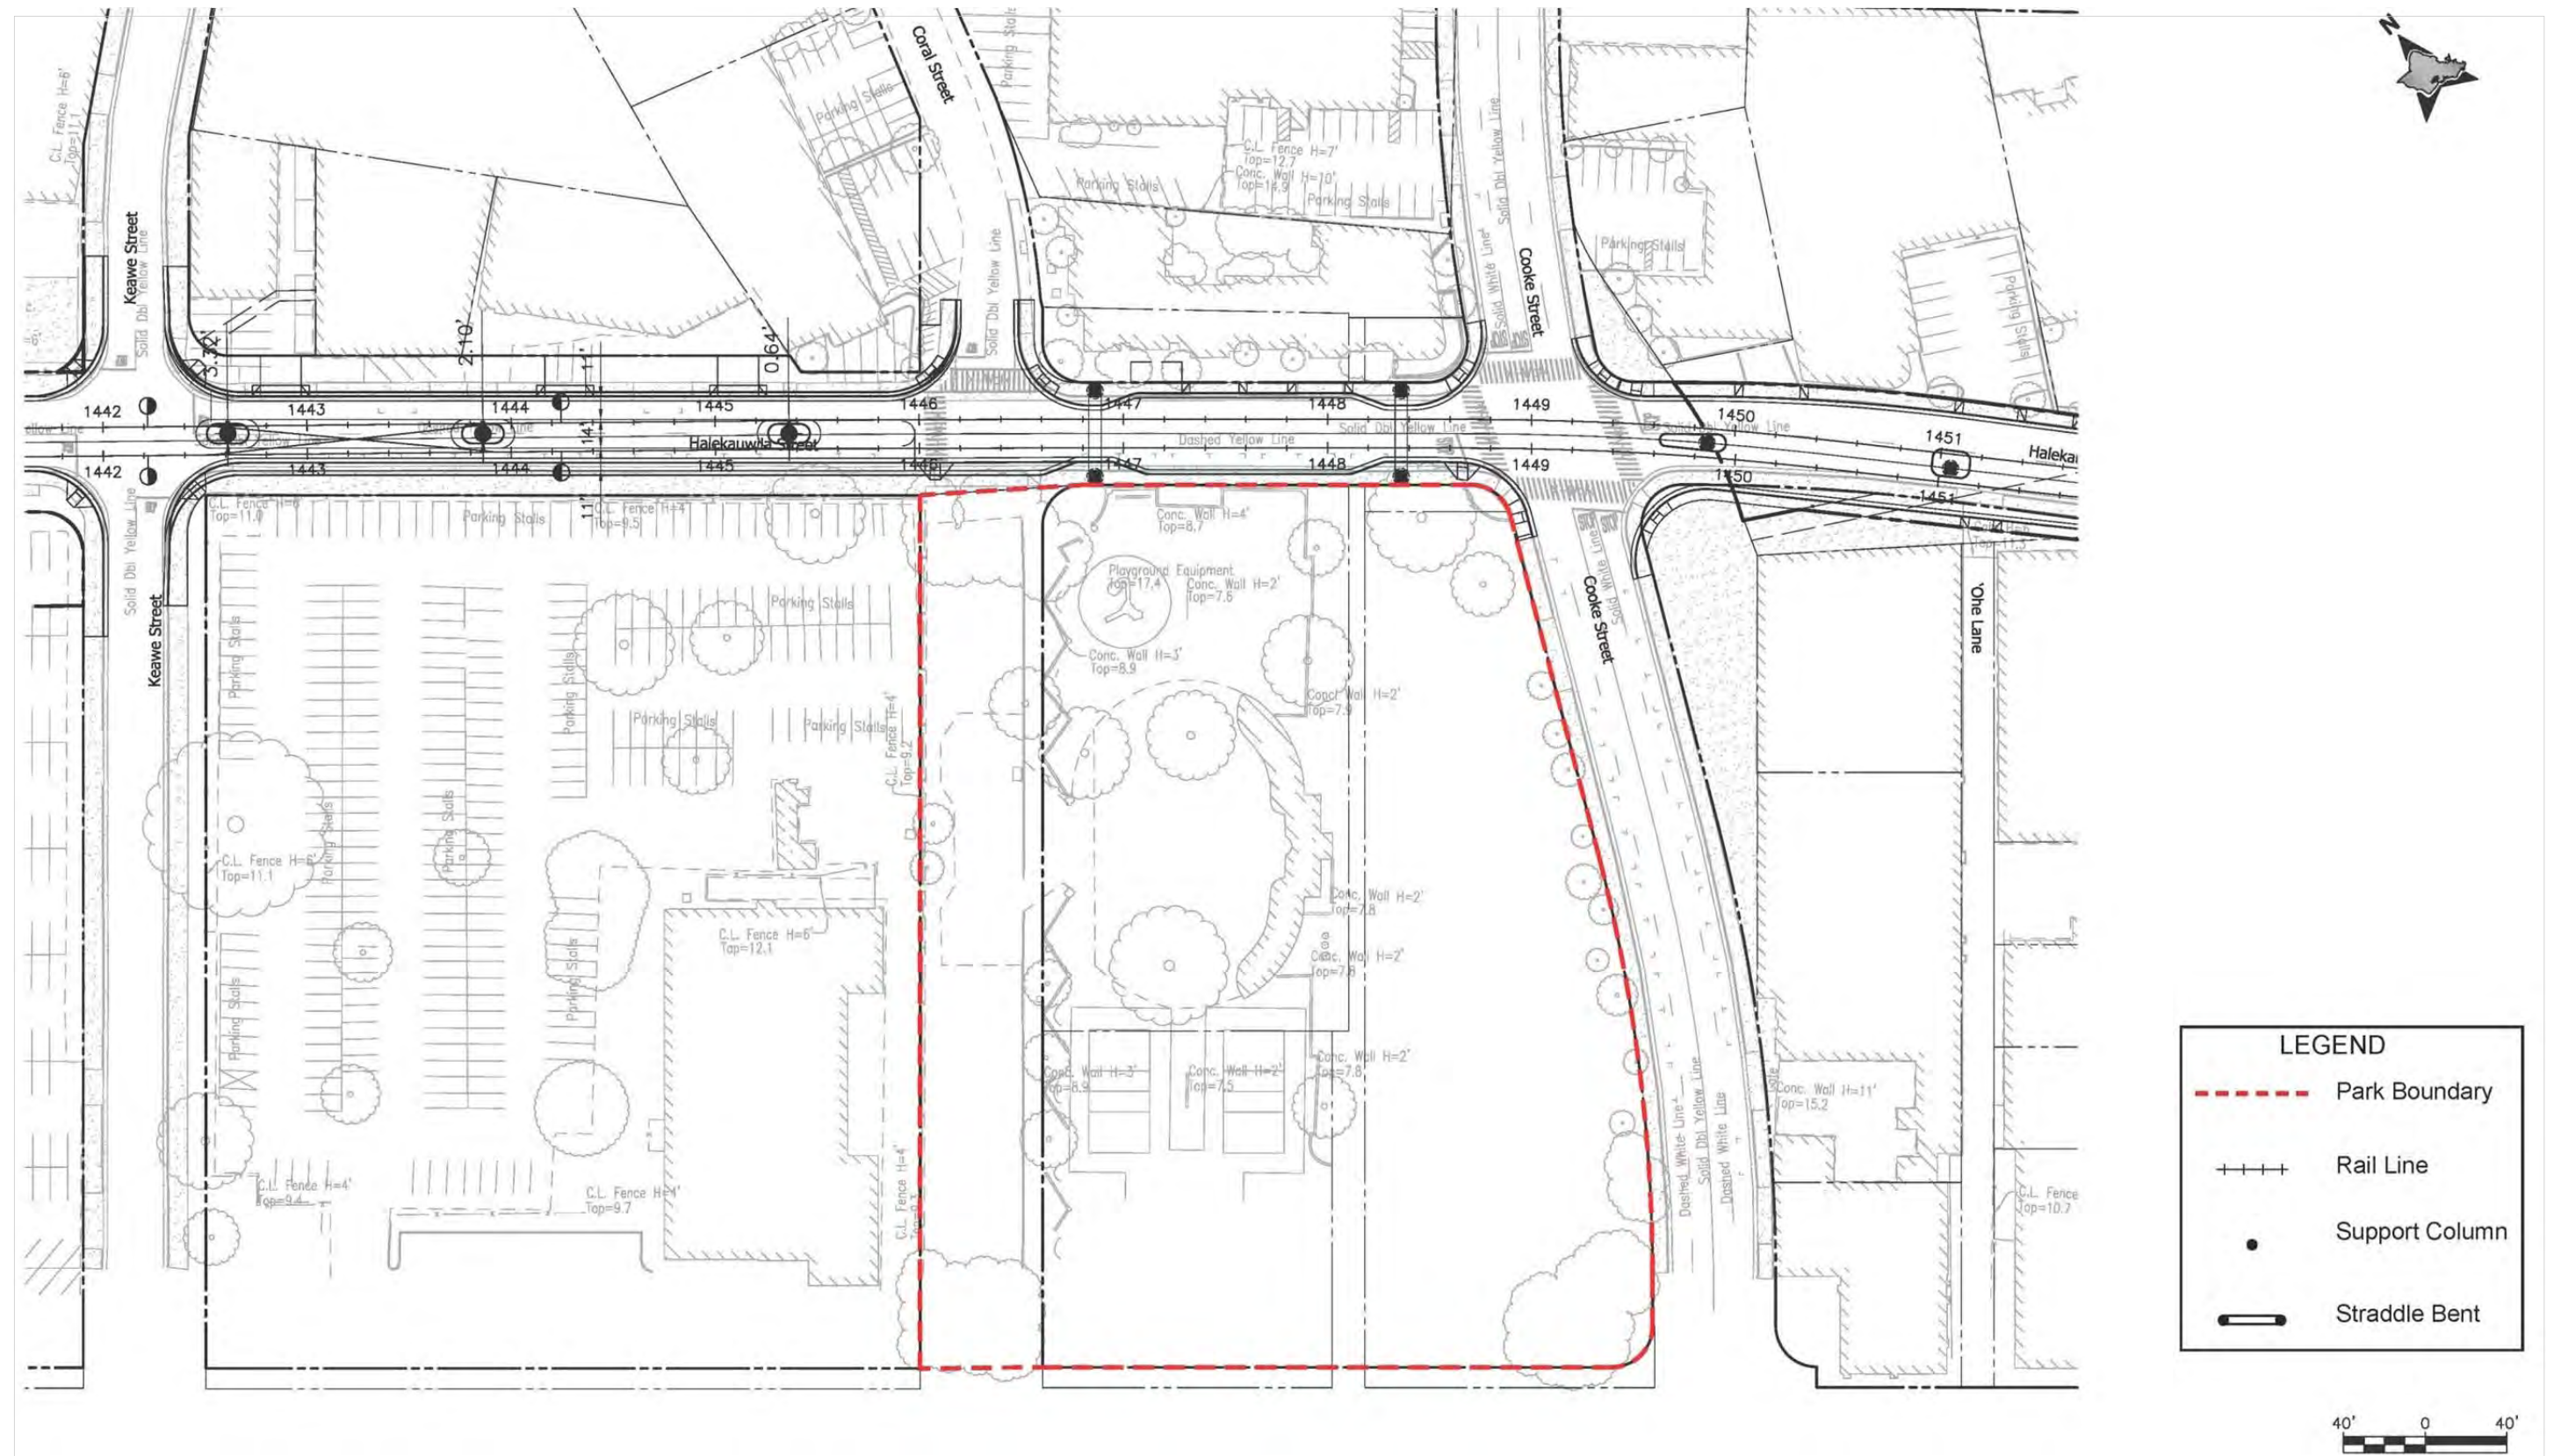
Detail of Honolulu Rail Transit Project in Relation to Mother Waldron Neighborhood Park
